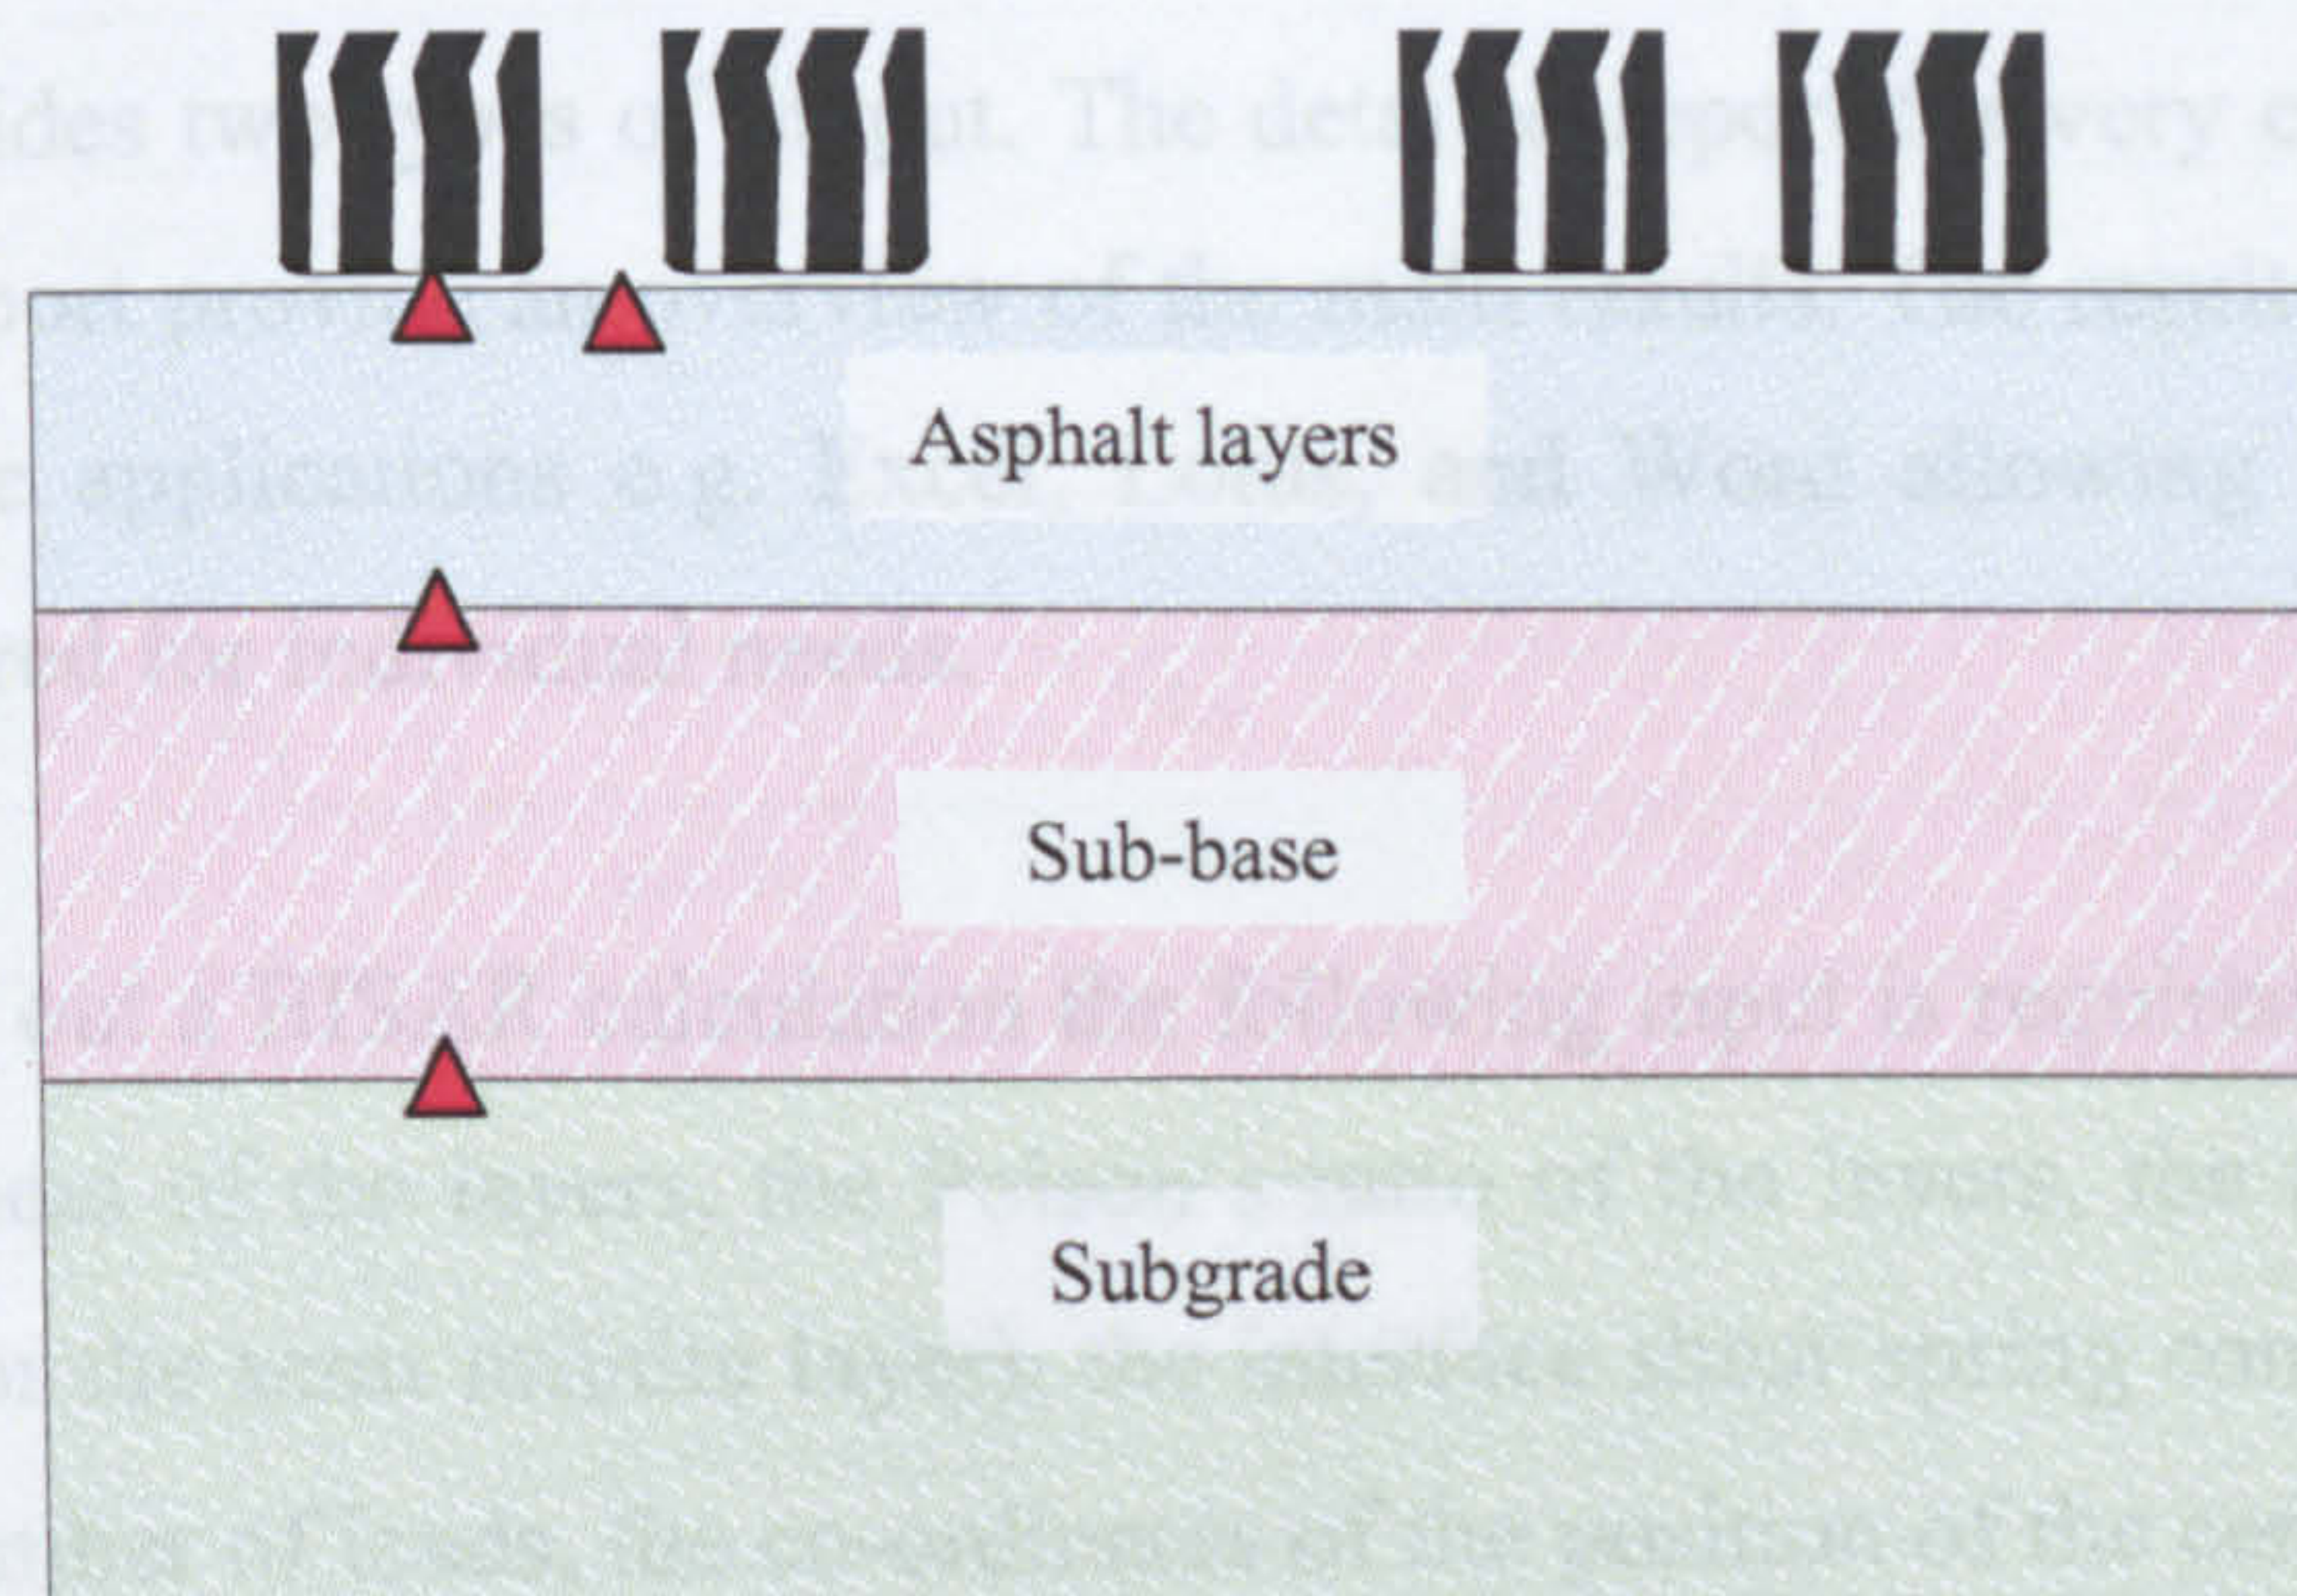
Various layers in a pavement structure and critical strain positions
